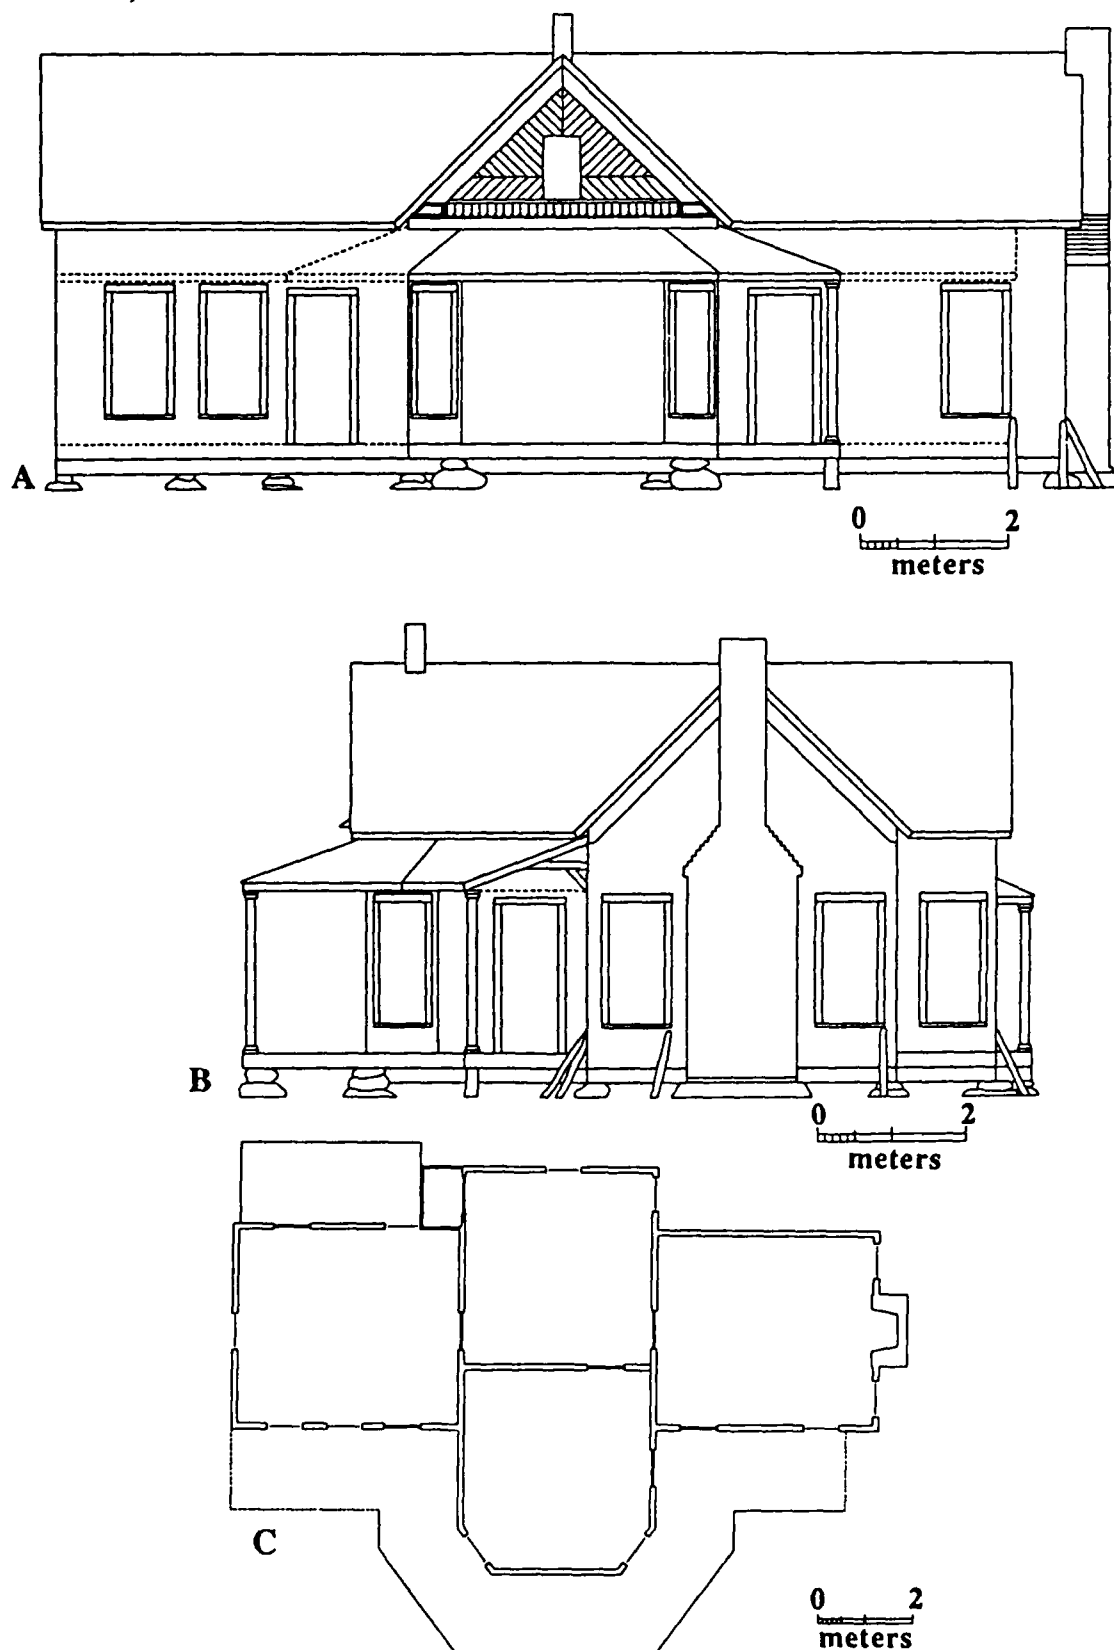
Elevations (a, b) and floor plan (c) of the dwelling at 41TR42 (taken from Ferring and Reese 1982:Figure 11-9.)
